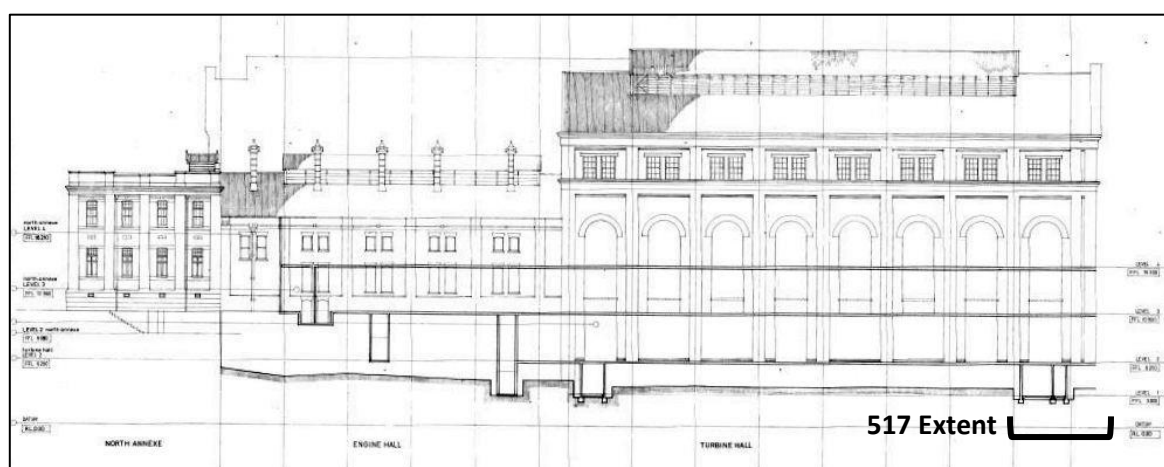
1984 MAAS Stage 2 Construction plan with the extent of 517 off Harris Street marked. Section 14 faces West and pictures the North Annexe, Engine Hall and Turbine Hall (left to right). The basement of the Turbine Hall is 3.2m deep. The approximate location has been marked.
